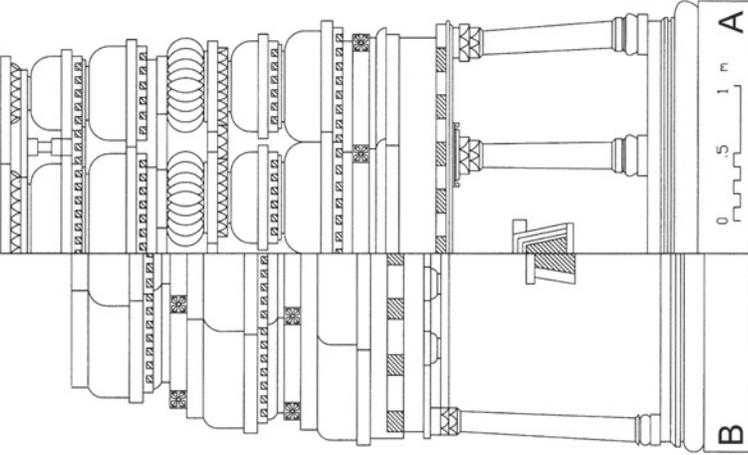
Kâfirkoç, Temples B and A, schematic elevations without surface ornament.
